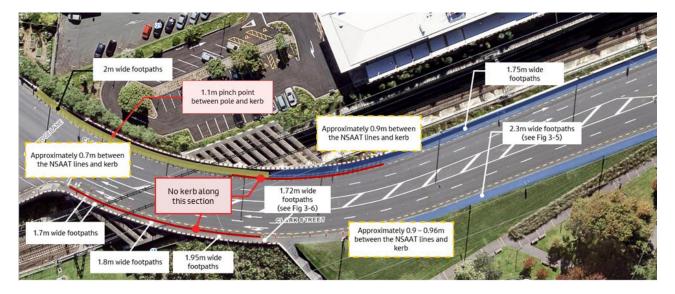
Site visit observations and footpath widths for Clark Street south of Cambridge Lane
